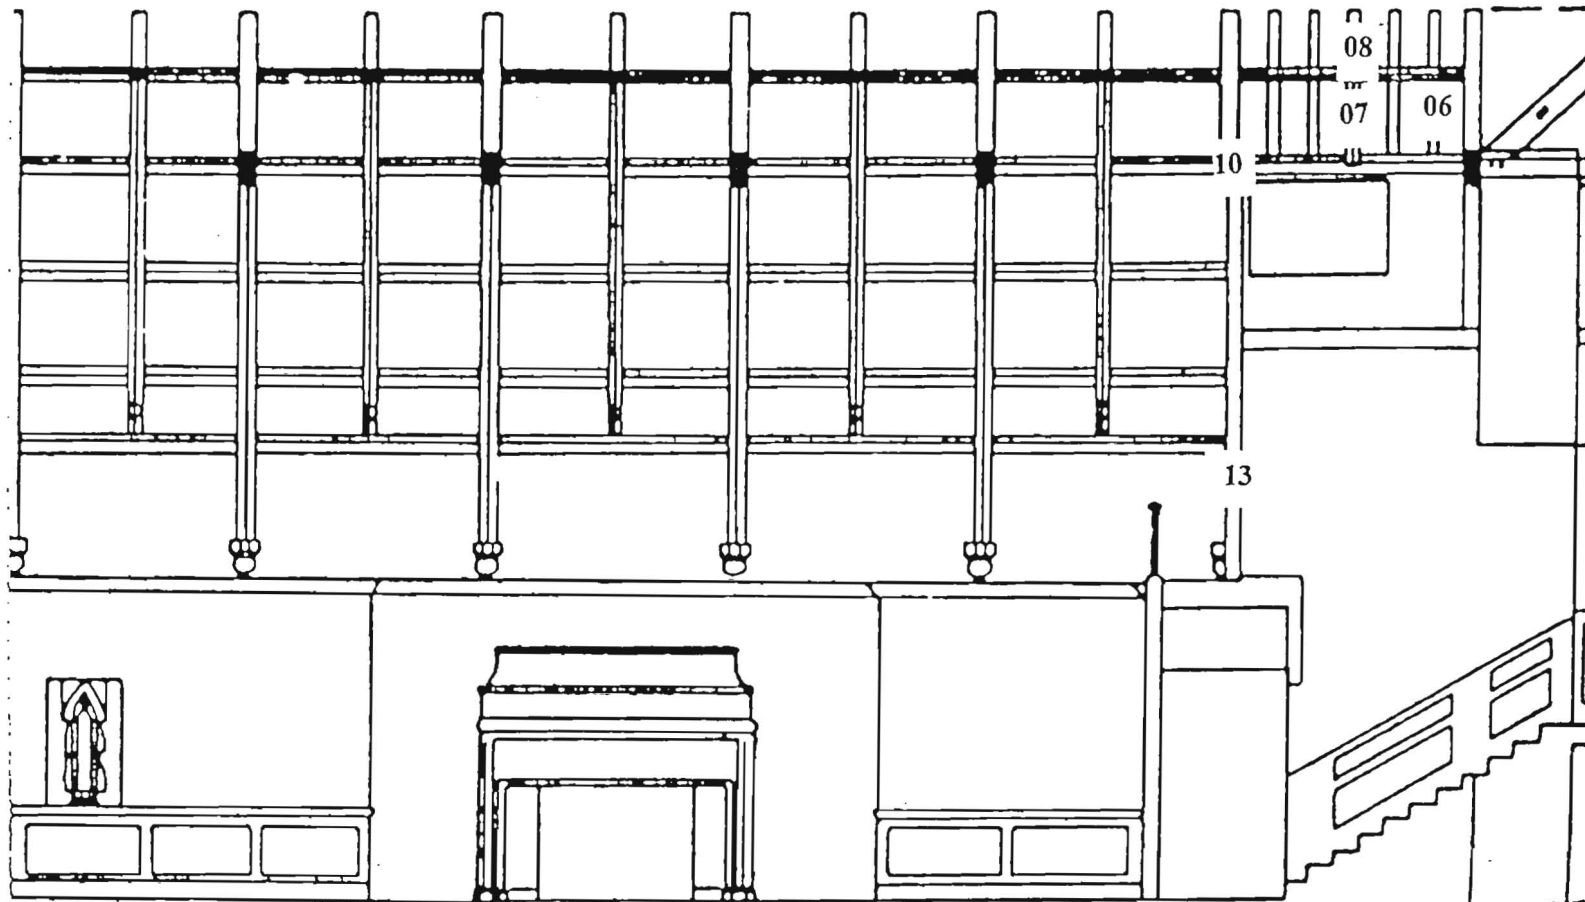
Section of the Great Chamber roof looking south to show sample locations
